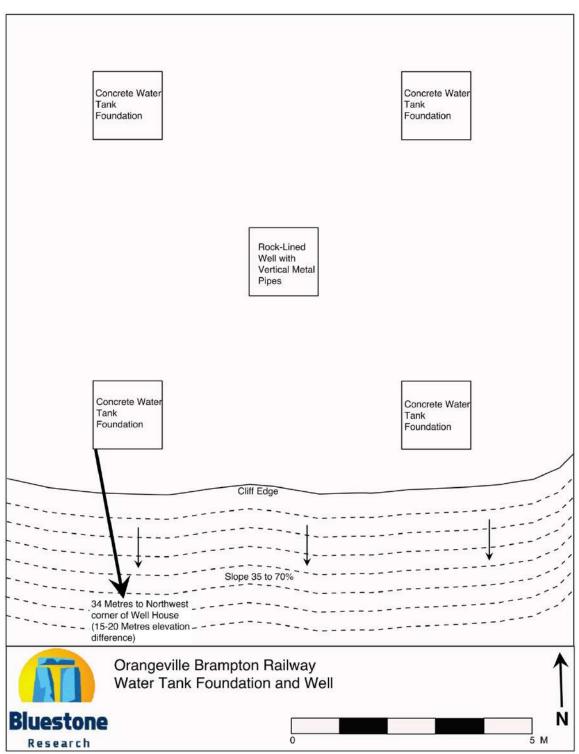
Schematic Drawing of the Railway Water Tank Foundation and Well.
